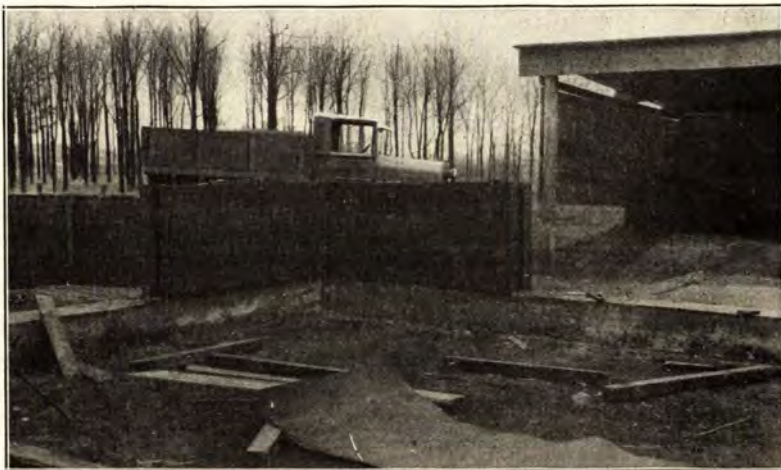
A LARGE CORNER SECTION COMPLETED.
